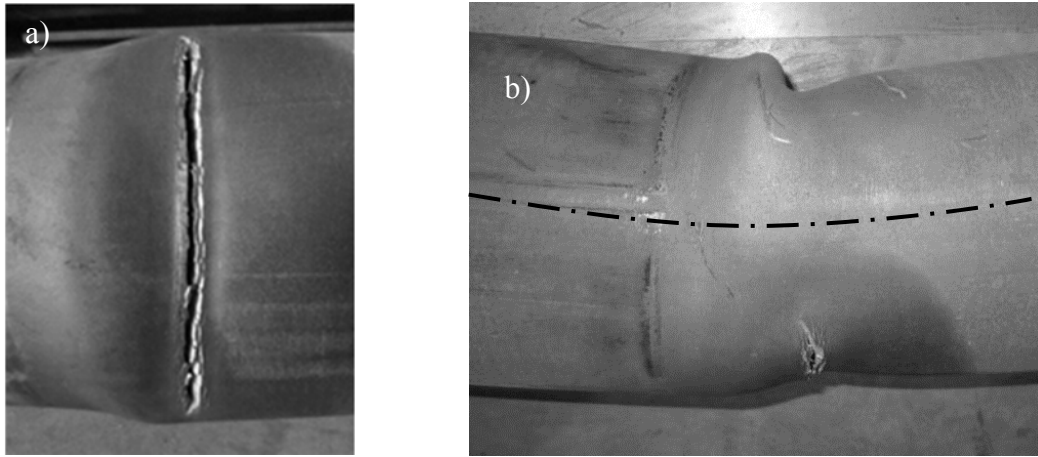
Fracture location from Test A: a) detail view of a macroscopic crack; b) side view of the buckled pipe [7].
